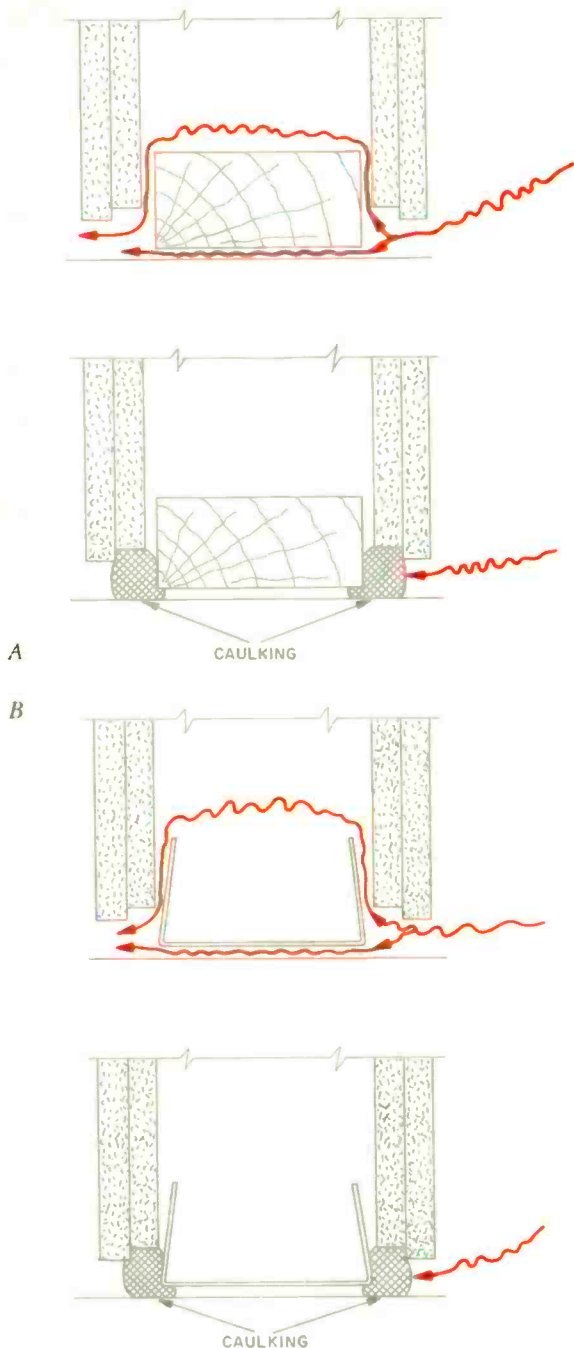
Plan view showing common leakage paths through party walls using wood studs (A) and steel studs (B). Caulking with non-hardening sealant stops such leaks.
